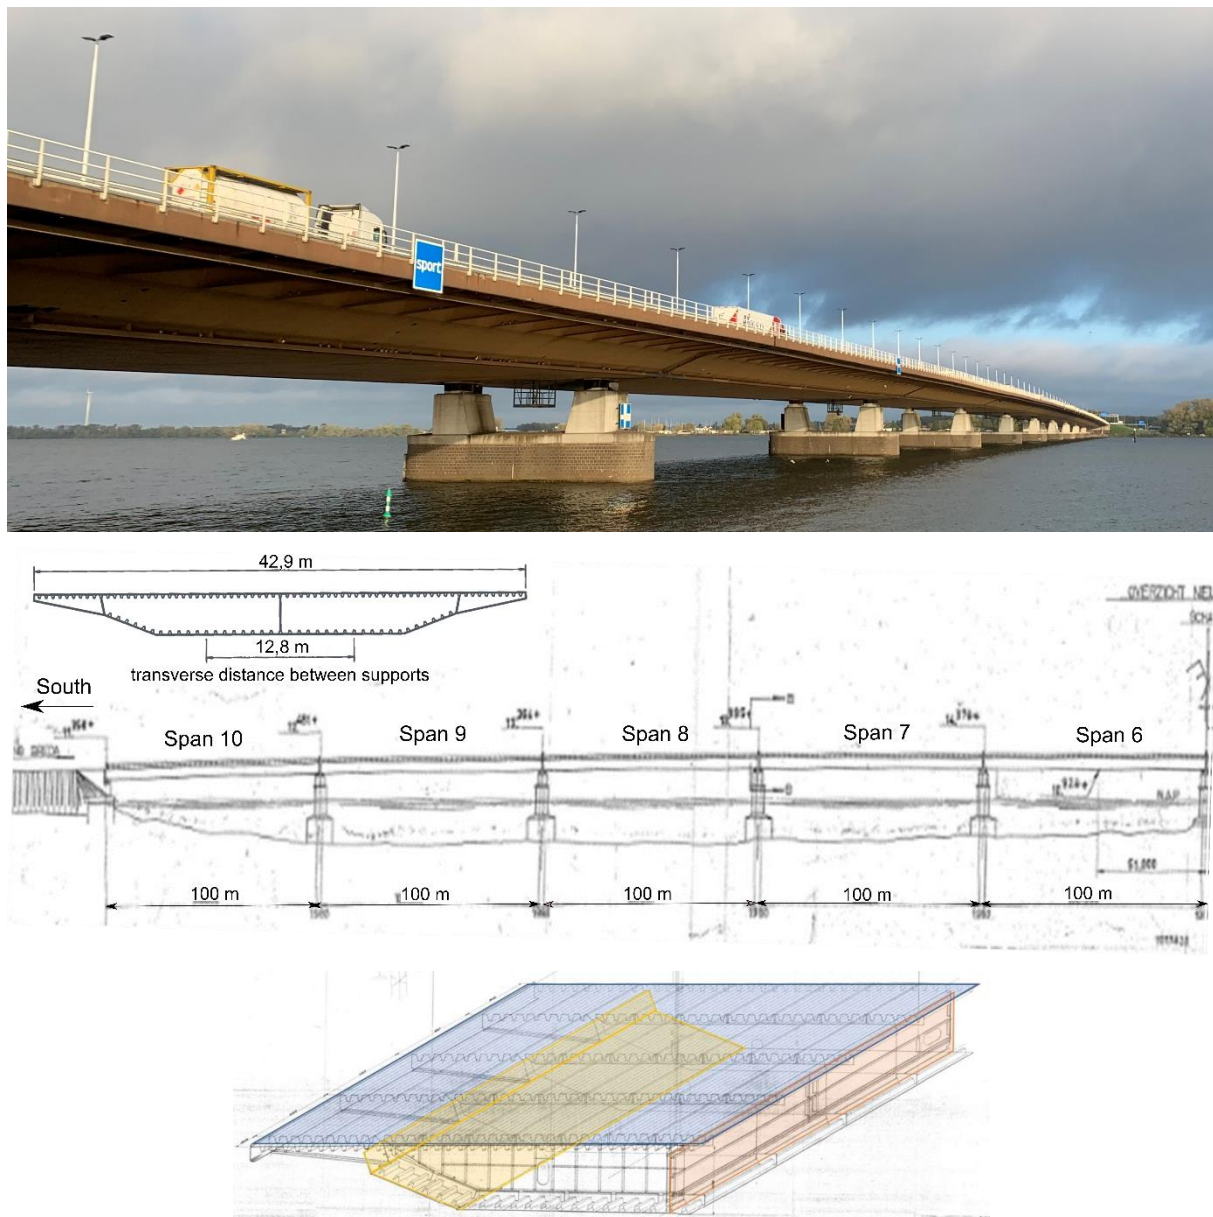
Top: Road bridge consisting of ten simply supported steel box girders. Center: Elevation of the southern half of the bridge together with an illustration of the cross section of the box girder. Bottom: Half of a regular segment of the box girder. Transverse bulkheads are spaced at 4.17 m intervals and a longitudinal bulkhead is located at the centerline of the box girder.
